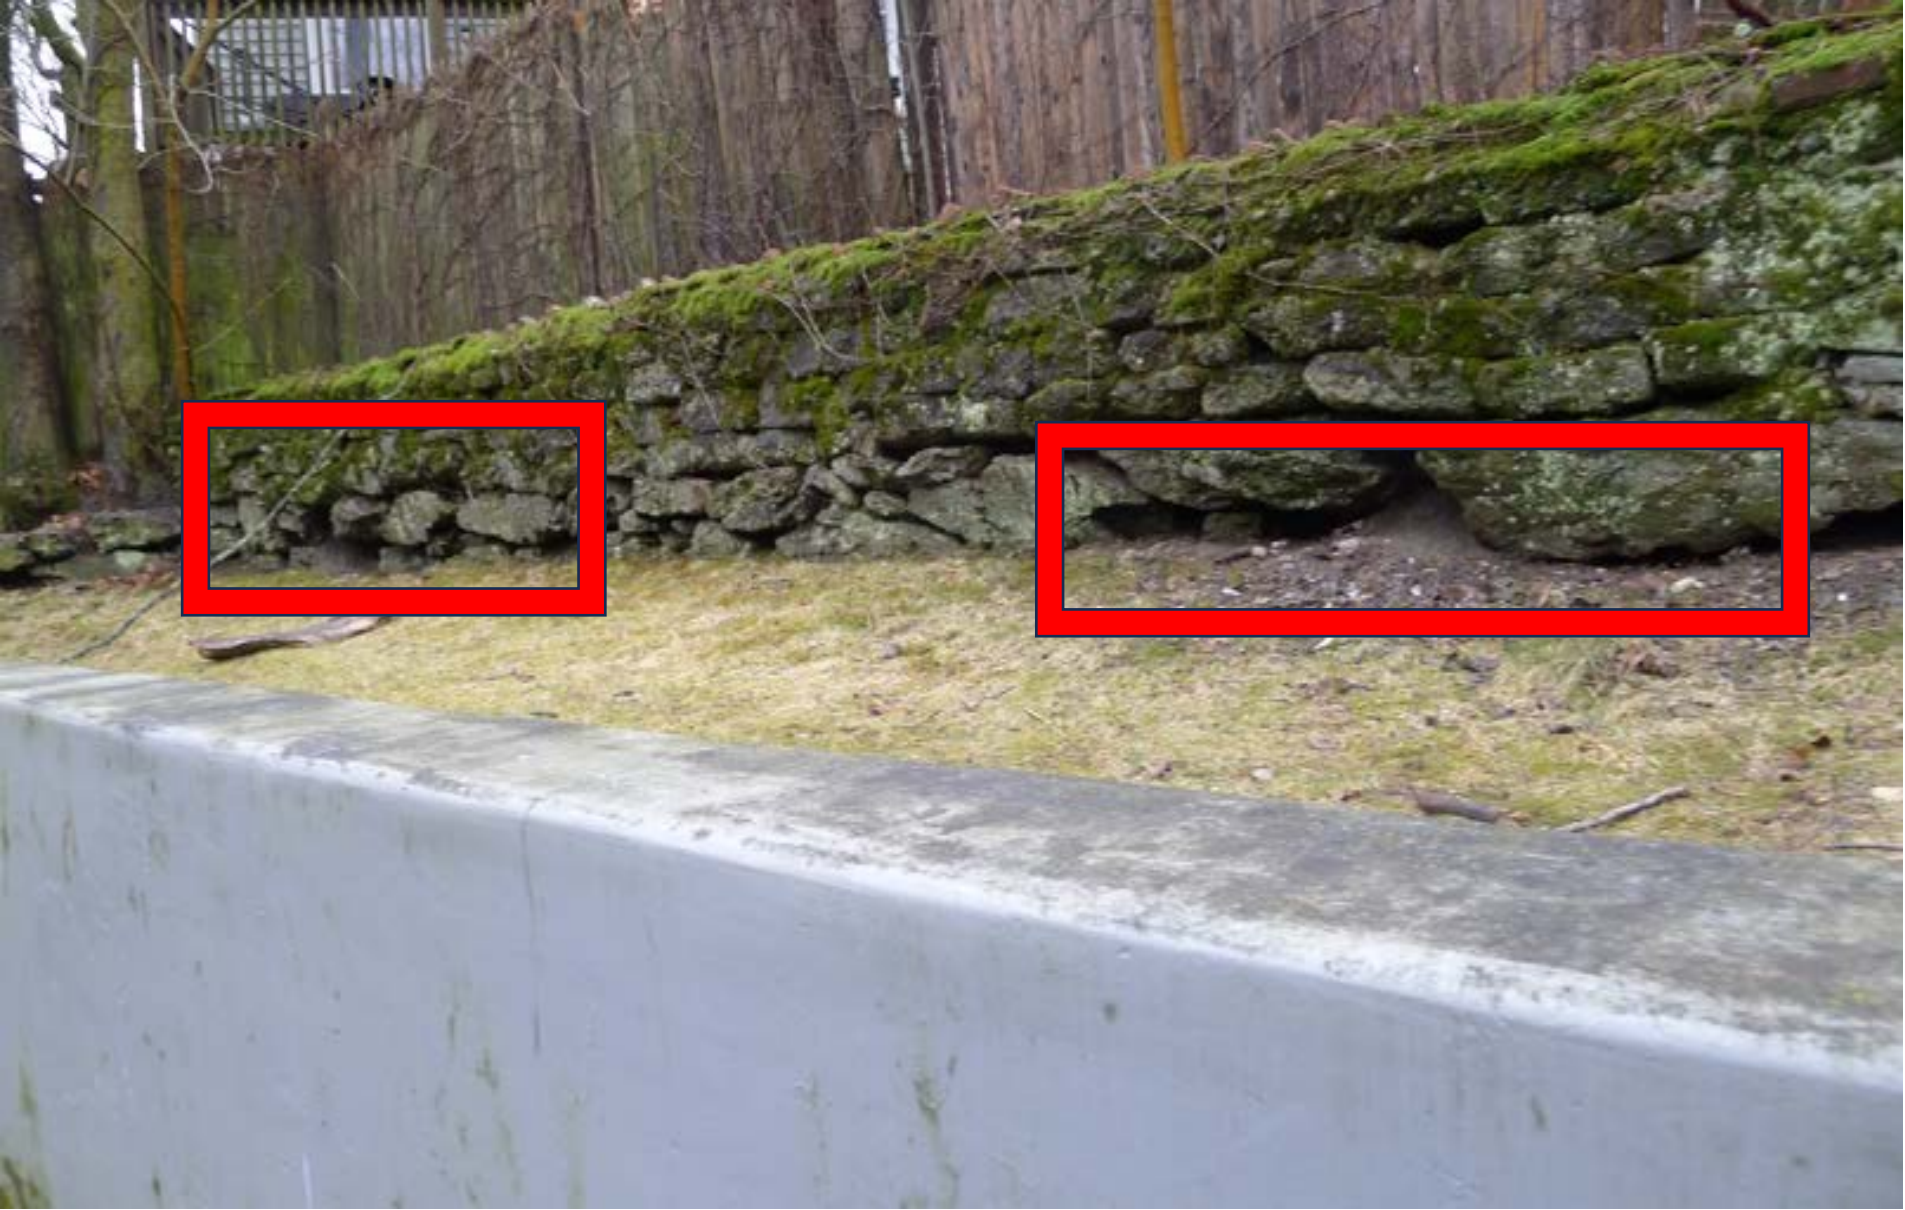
Rats burrowing and quickly disassembling a stone wall in a small park space in Roxbury. Once the stone wall collapses, then what?
